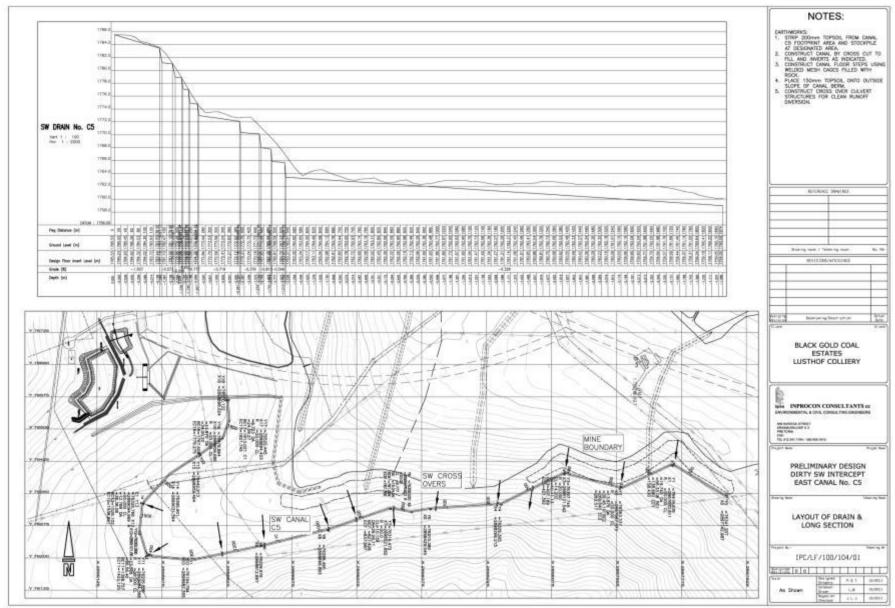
(a): Dirty Storm Water Intercept East Canal - Layout of Drain and Long Section.
